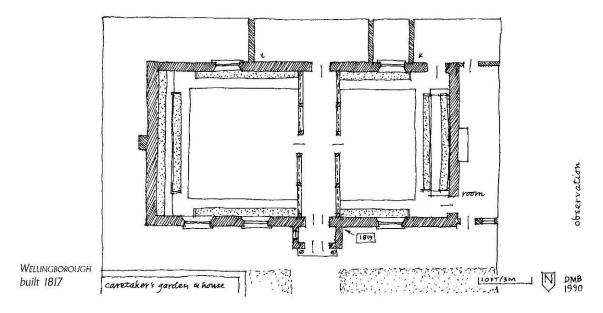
Plan of the meeting house as originally designed, Butler, Vol. 1, p. 472
